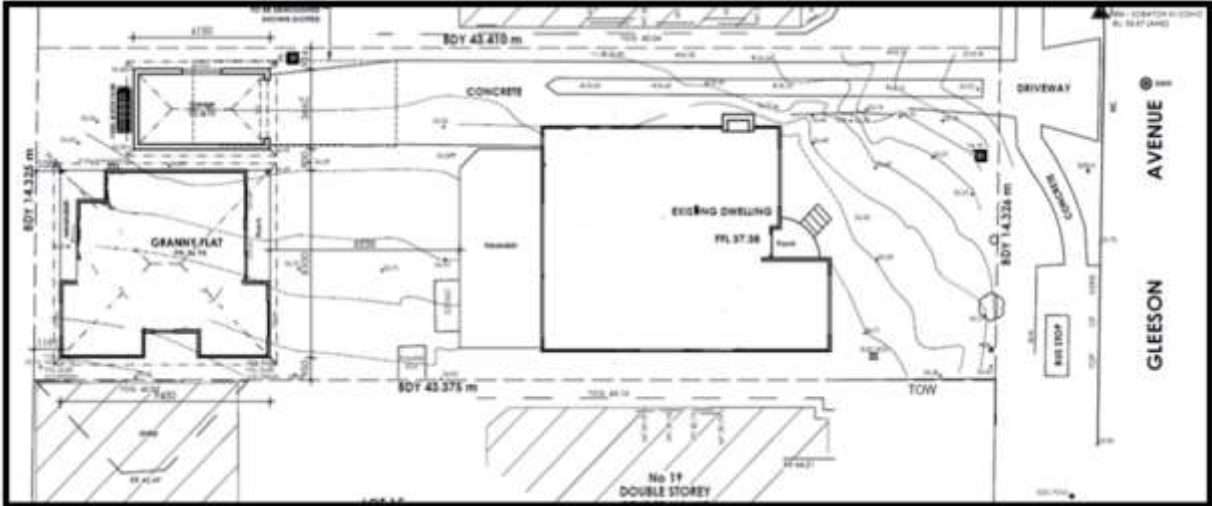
Site Plan. Source: ACM Civil & Structural Engineers
